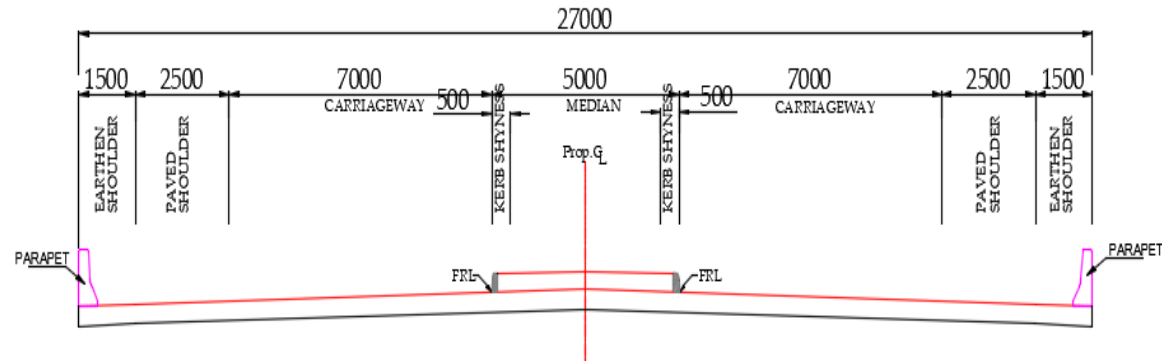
4-Lane- Buried Culvert (Pipe and Slab) at road level (TCS-9)
